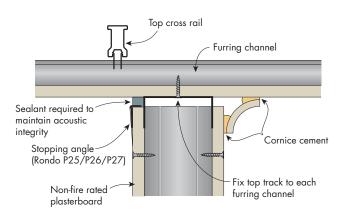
Wall Head to Suspended Ceiling Finishing Detail
